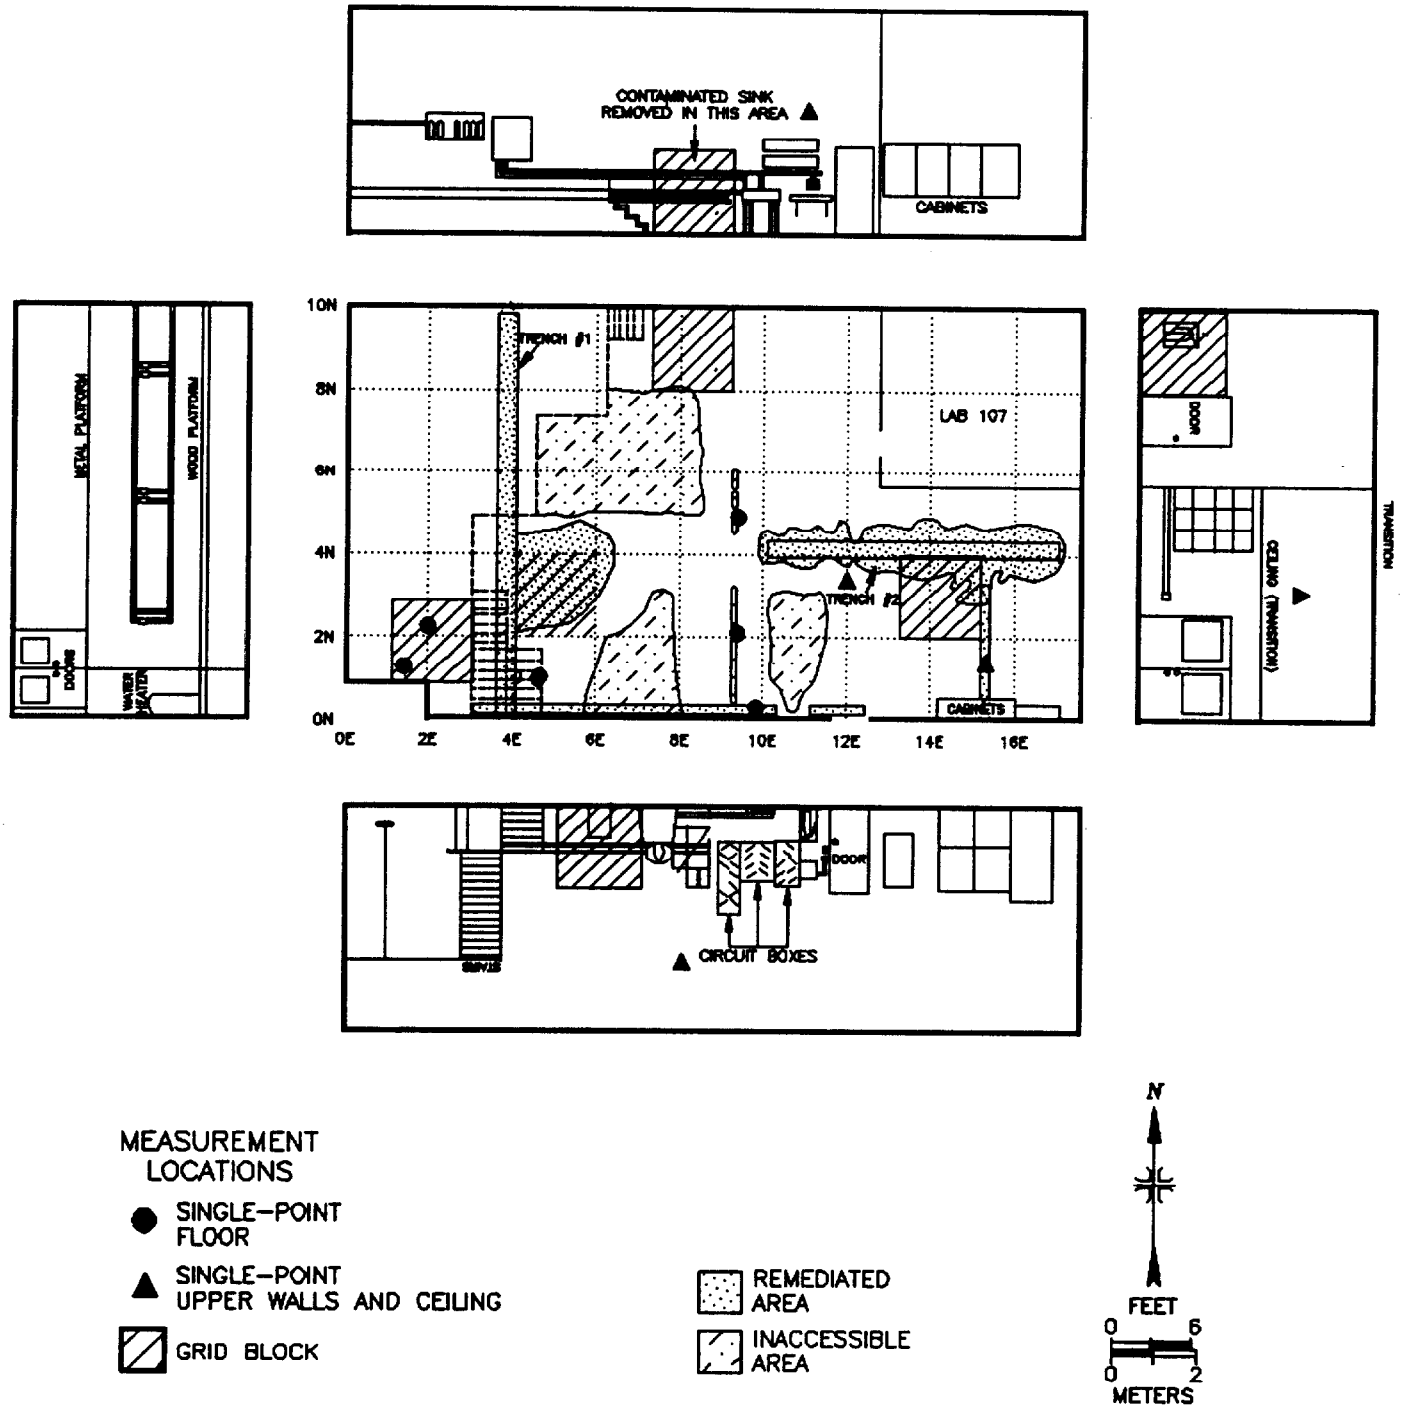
Building 24, Room 106 – Remediated Areas and Measurement Locations
